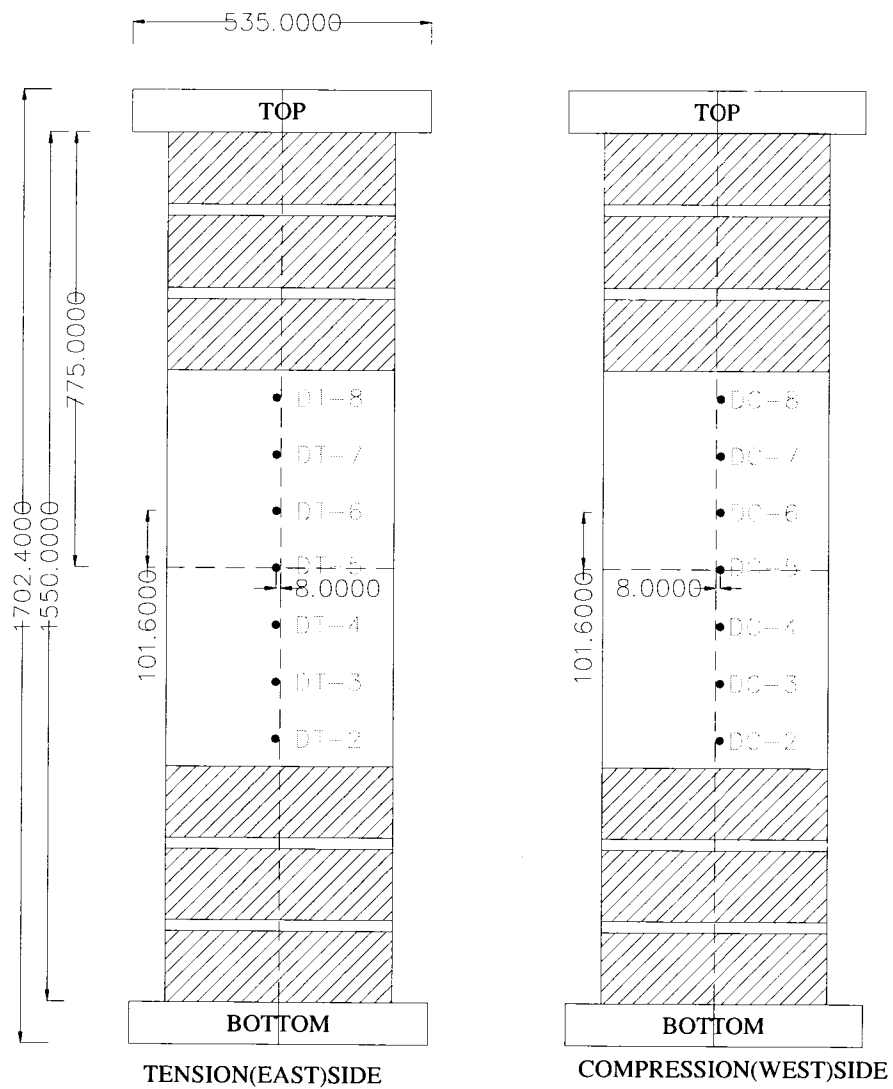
Demec Layout for 16 inch Pipes - Modified
